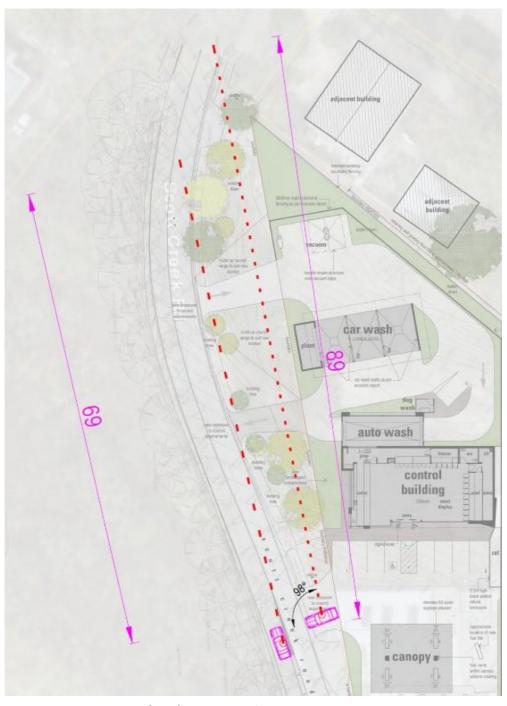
Required SISD(EDD) and MGSD for a driver accessing the proposed retail fuel outlet on Scott Creek Road
